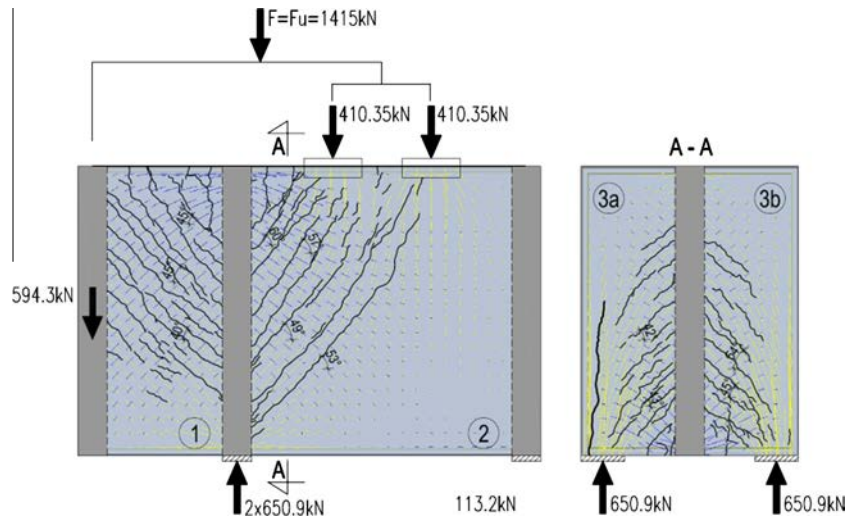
DBII deep beam crack on the background of main stress trajectory, with the failure load  $F_u = 1415$  kN.
